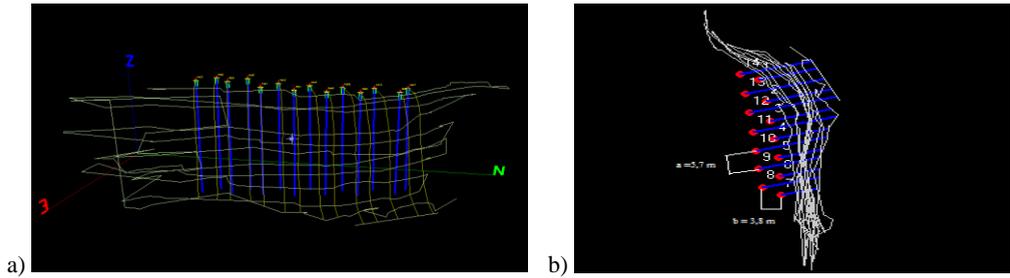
View 3D (a) and technical parameters (b) of blasting no 2 in Cement Plant Warta excavation
